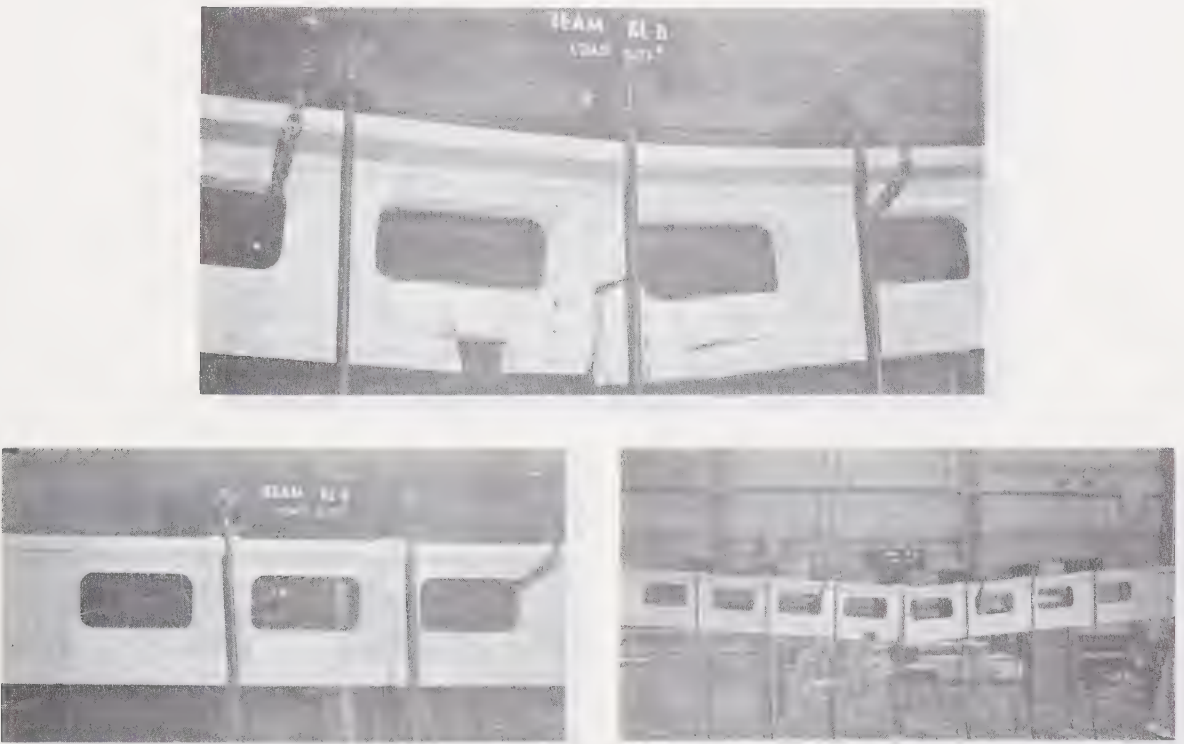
CRACKING AND FAILURE PATTERN OF BEAM 8-16-7L
